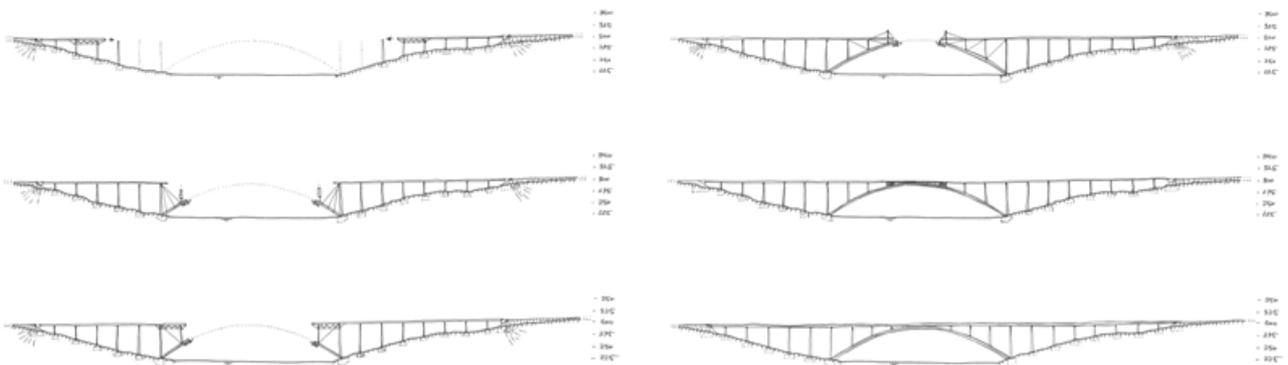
Construction alt. 2. Truss-method cantilever erection using the deck as the top chord
